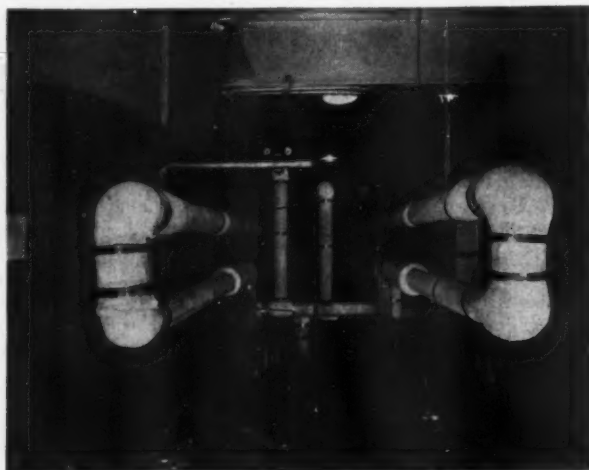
REFRIGERANT COMPRESSORS AND CONNECTING PIPING,
